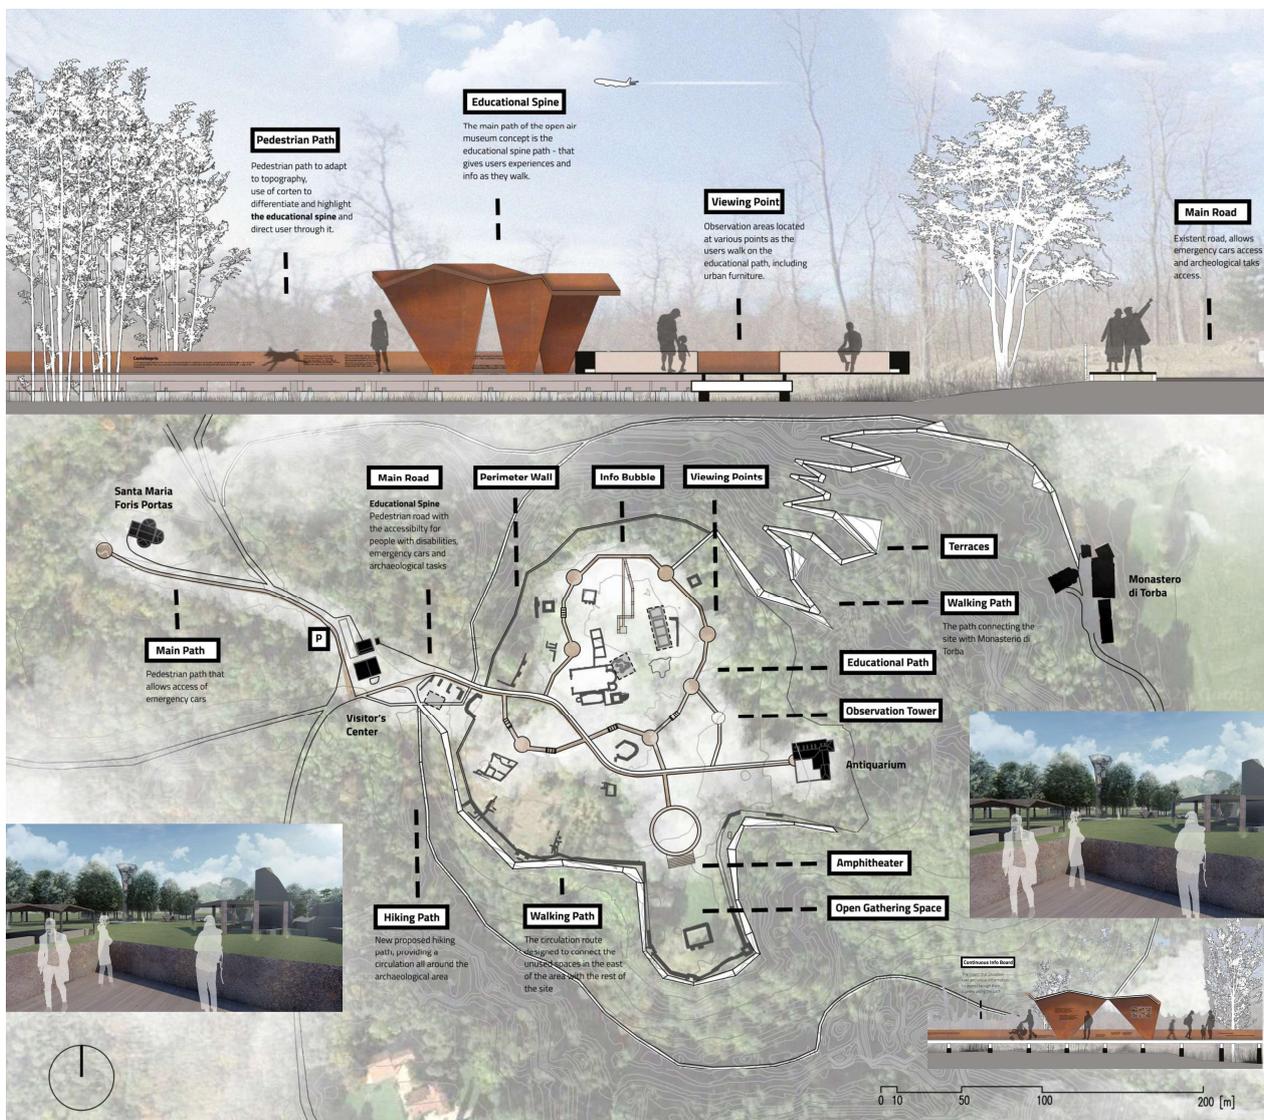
Open air architectural park (source: Design team composed of the students Andrew Barat, Andras Domokos, Andrea Sibaja, Berrak Gonul, and Camilla Quaglione).
